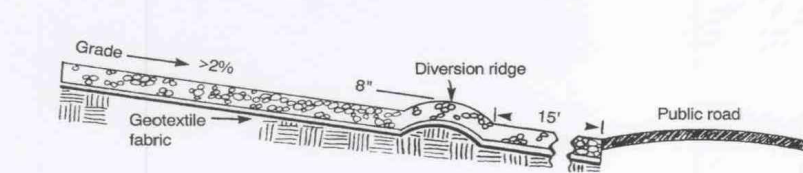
Cross-section of a Construction Entrance/Exit (NC, 1993)
